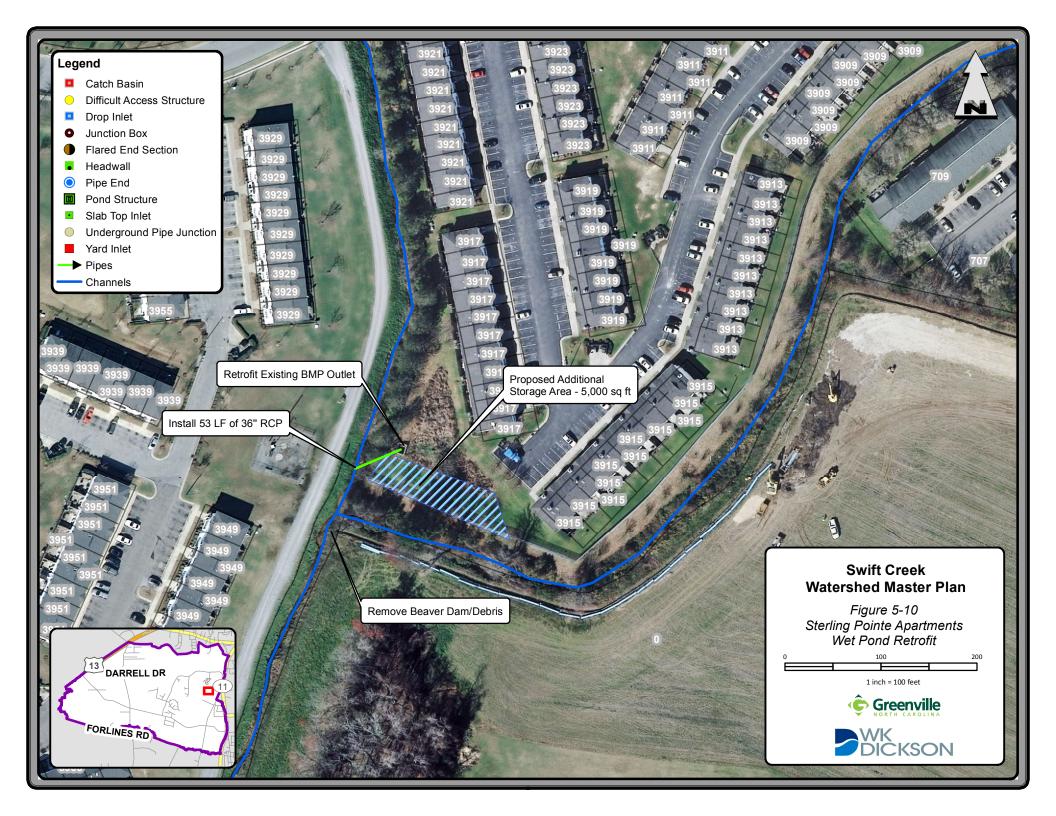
Proposed Location for Sterling Pointe Apartments Wet Pond Retrofit
